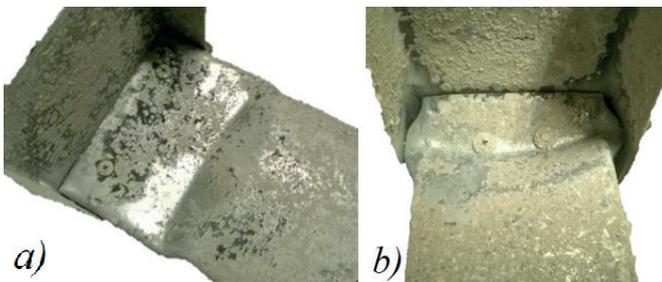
Failure shapes of encased elements: a) local buckling; b) connection failure
